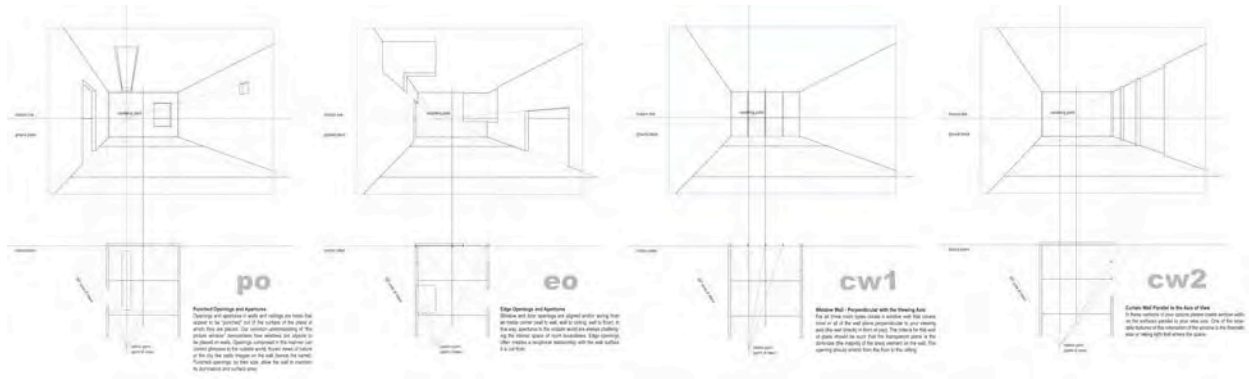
Four eye-aperture types (left to right): punched opening, edge opening, opposing curtain wall, adjacent curtain wall. Source: (Author 2021).
